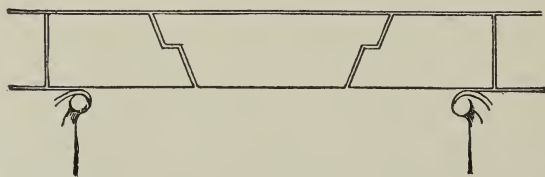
Composite Stone Lintel. Openings 10 or 12 Feet Wide. Always with Steel Supports.
